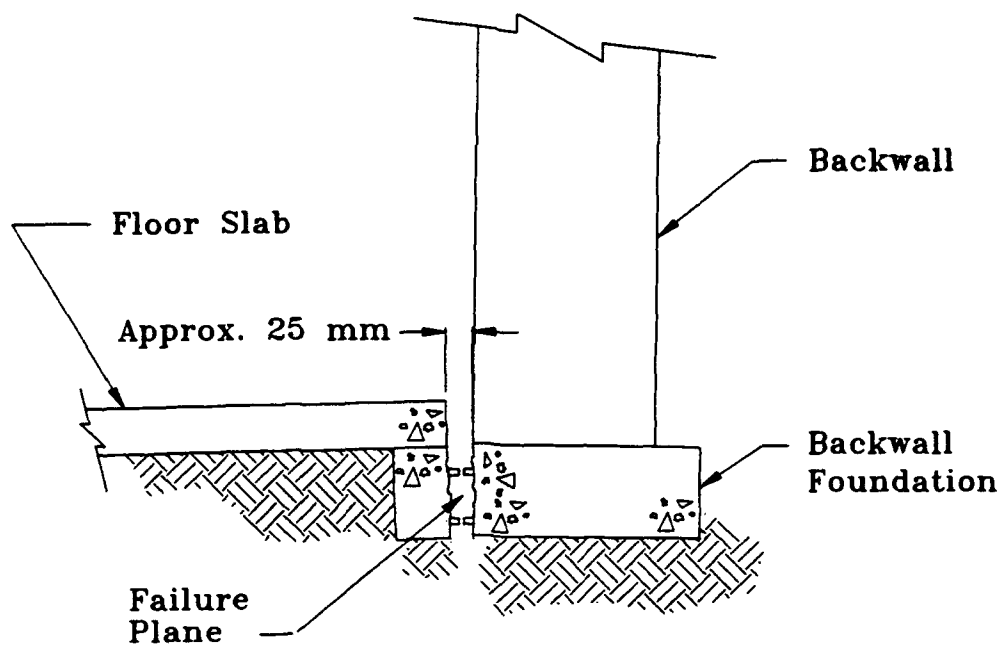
Section: Failure plane in backwall foundation, PAS-2.
